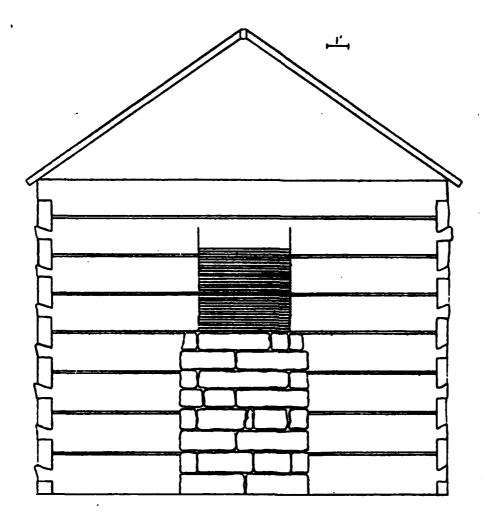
Jesse Johnson dwelling. Line drawing of right side of dwelling. Note remnant of daub wooden slaw chimney. The upper portion of the chimney was missing at the time of dismantling by the Corps of Engineers (Jesse Johnson, Jr. 1978, pers. comm.).
